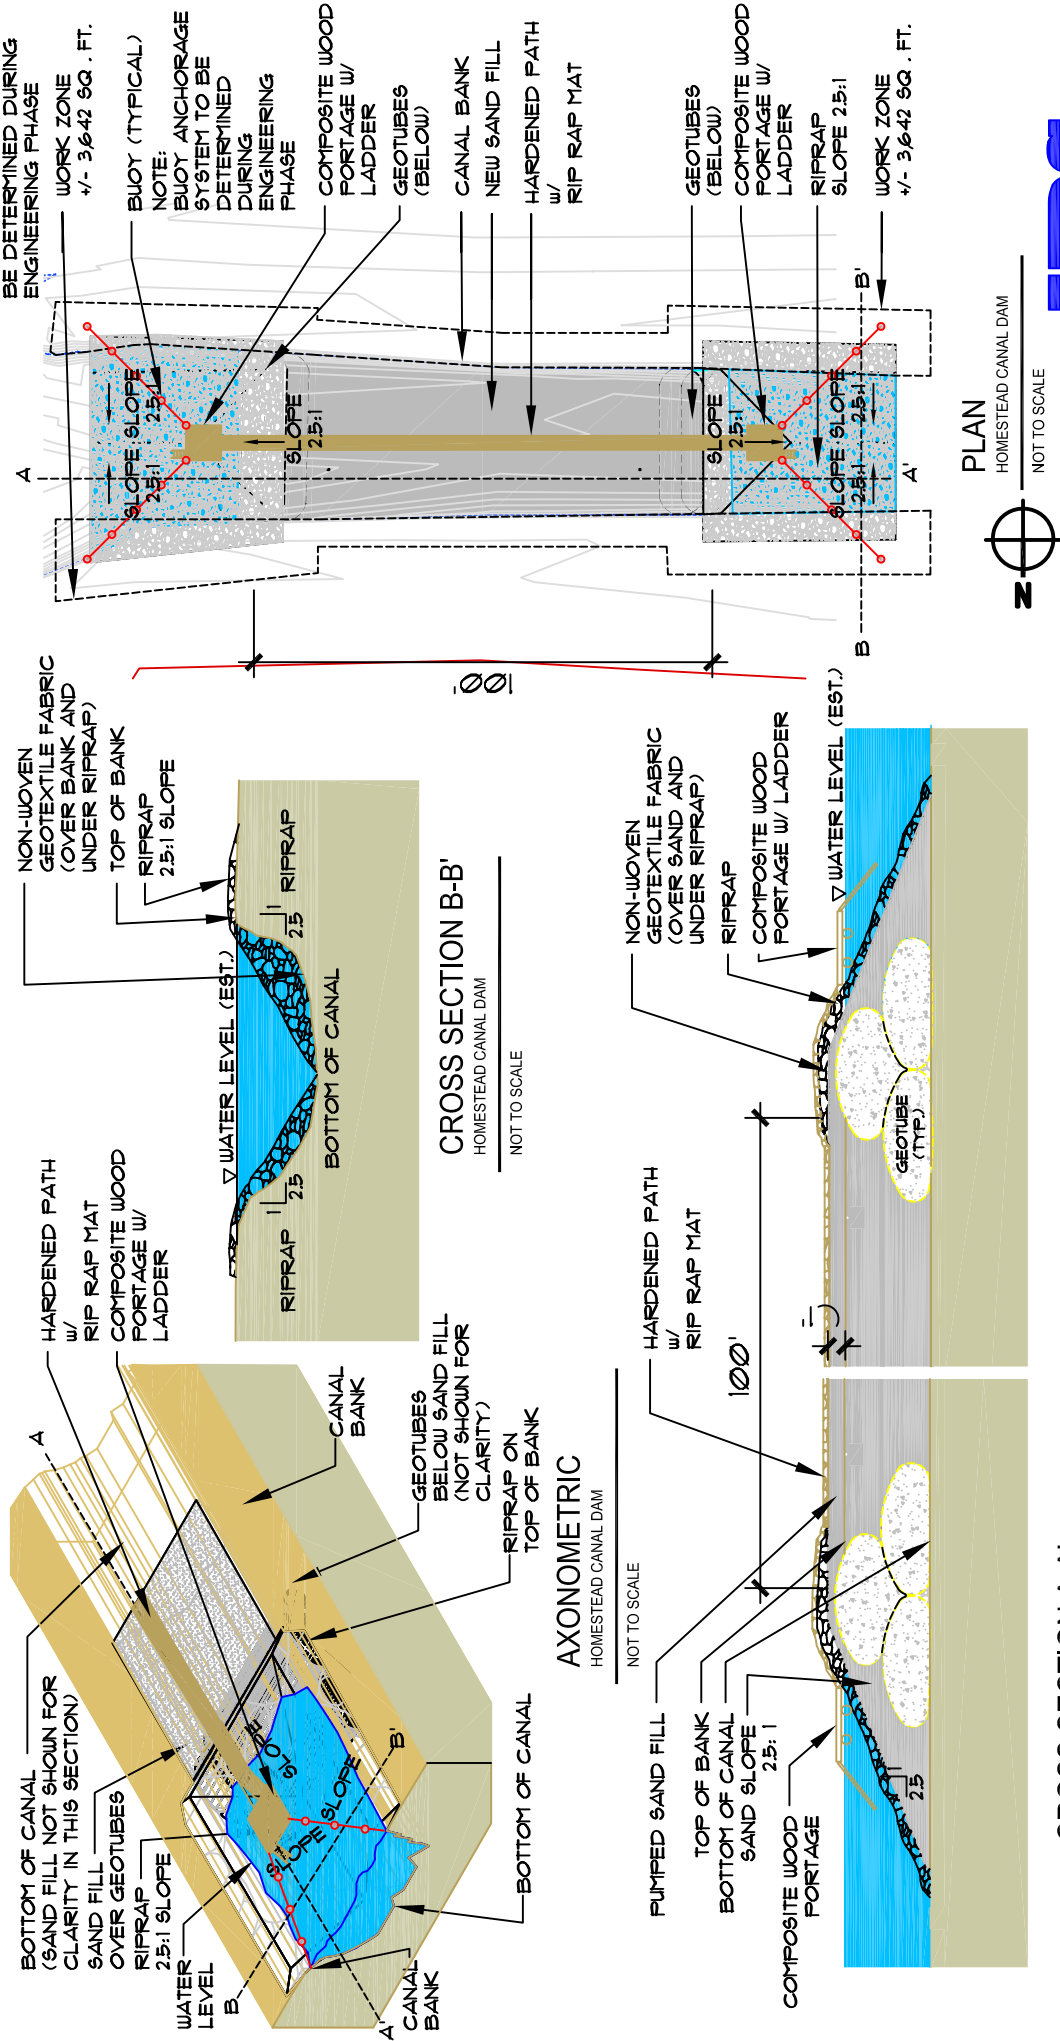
HOMESTEAD CANAL DAM - ALTERNATIVE D1 DRAWING
